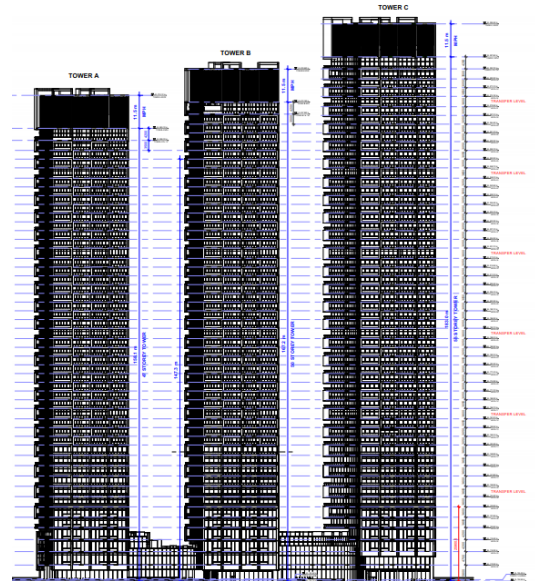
Updated South Elevation View, Courtesy of Distrikt
